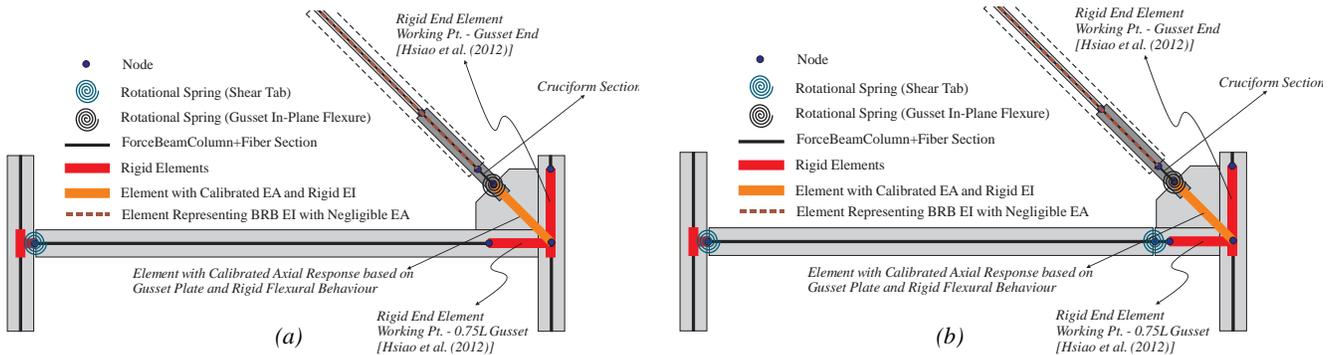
Improved Numerical Model Proposed for (a) Continuous Beam Detail, and (b) Stub Beam Detail
